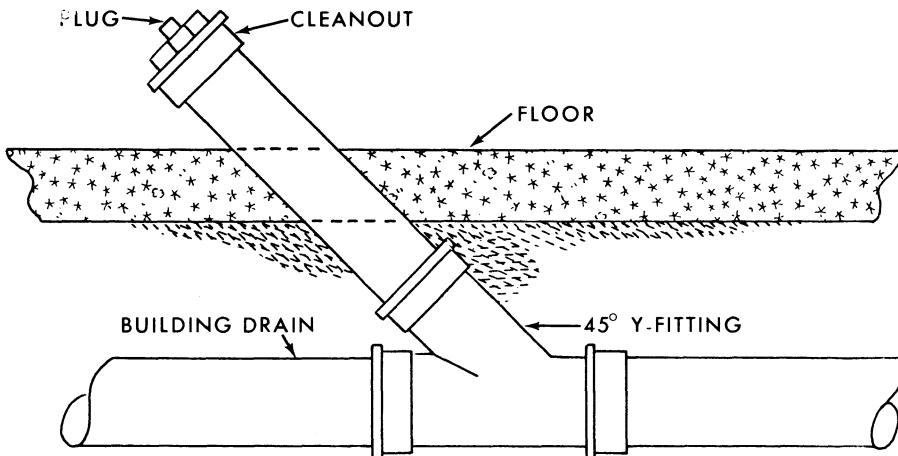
A 45° Y-fitting and cleanout in building drain.
